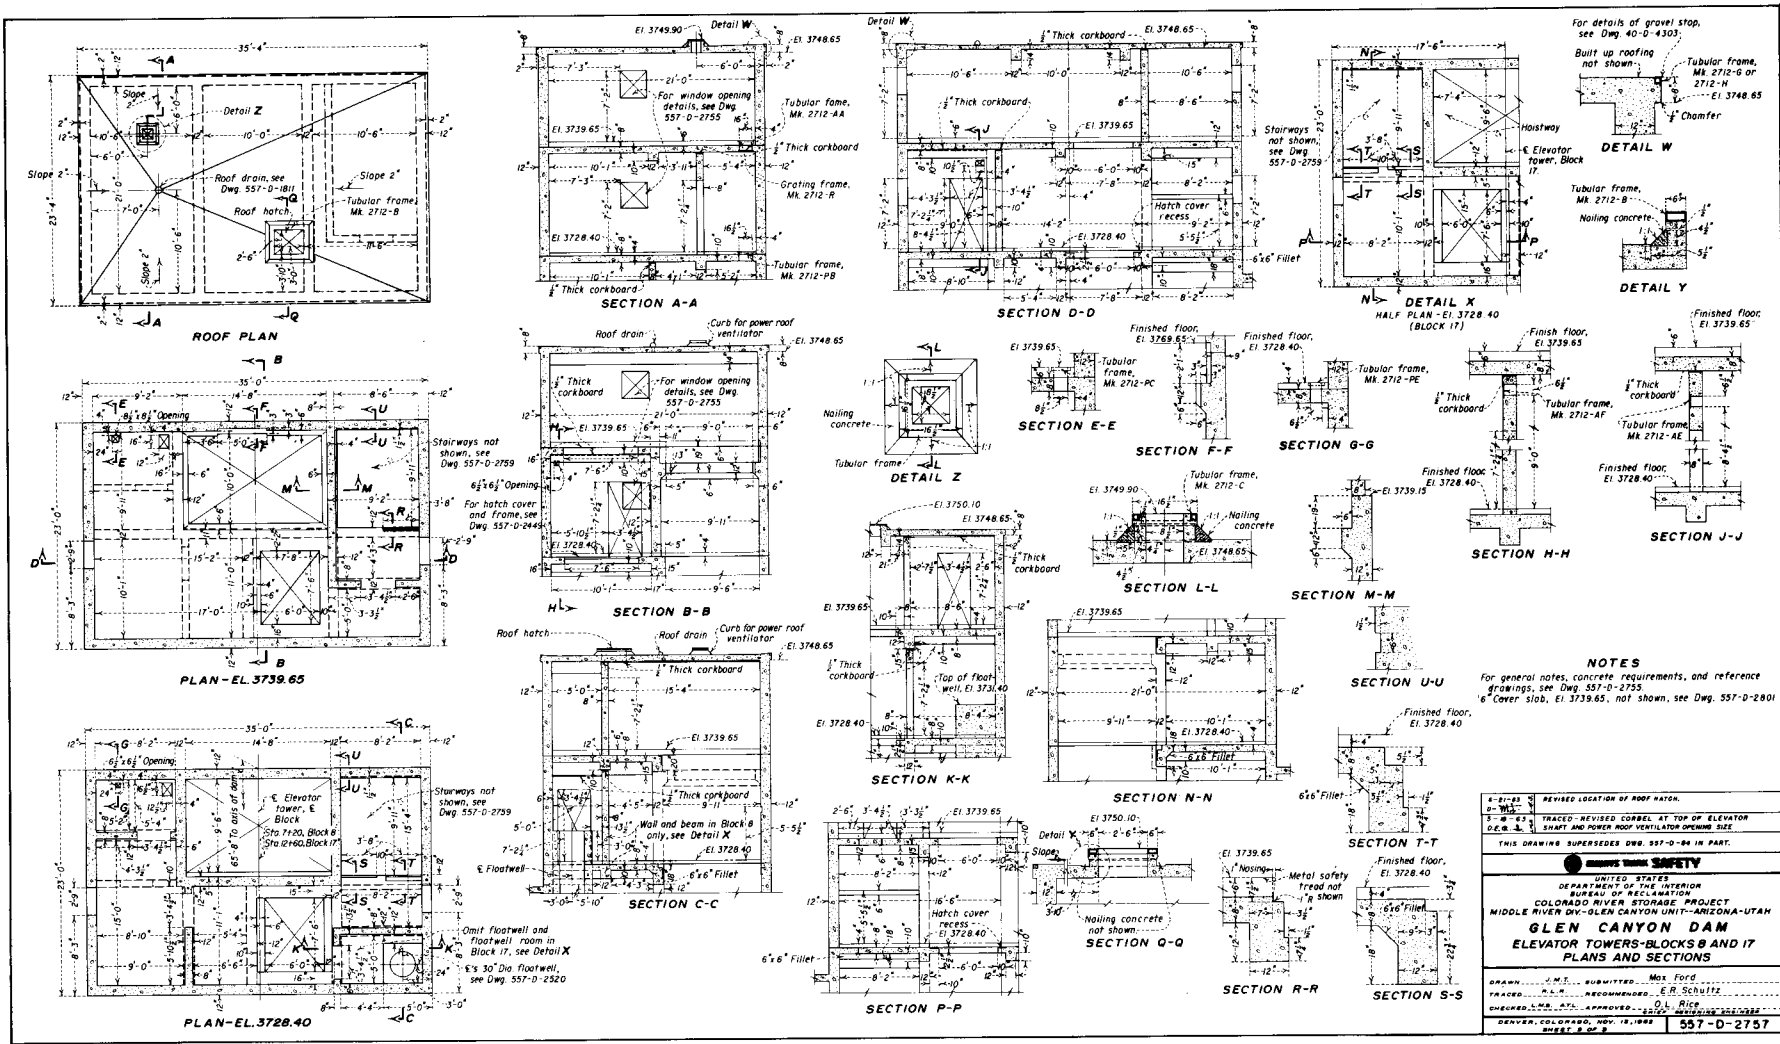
Dam elevator towers, blocks 8 and 17—Plans and sections. (Sheet 3 of 3.)
